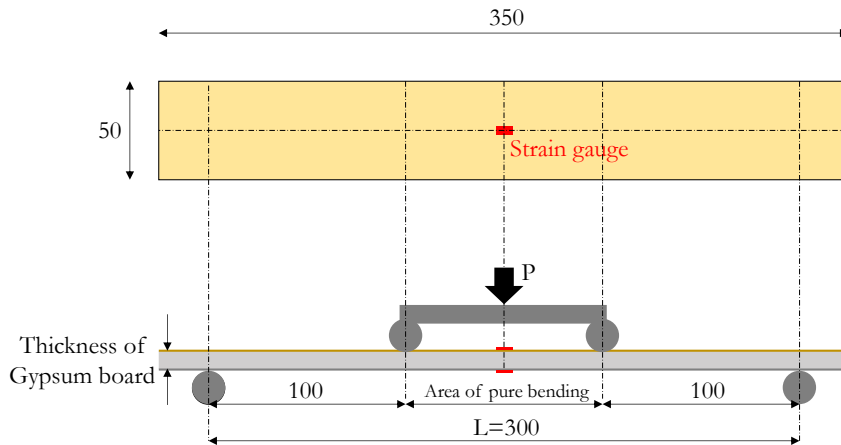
Set up and dimensions of a 4-point bending test of the gypsum board (units: mm).
